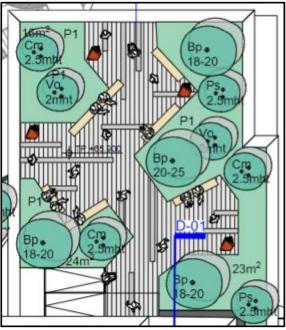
Landscape Plan of the External Amenity Space on Nineth Floor Level
